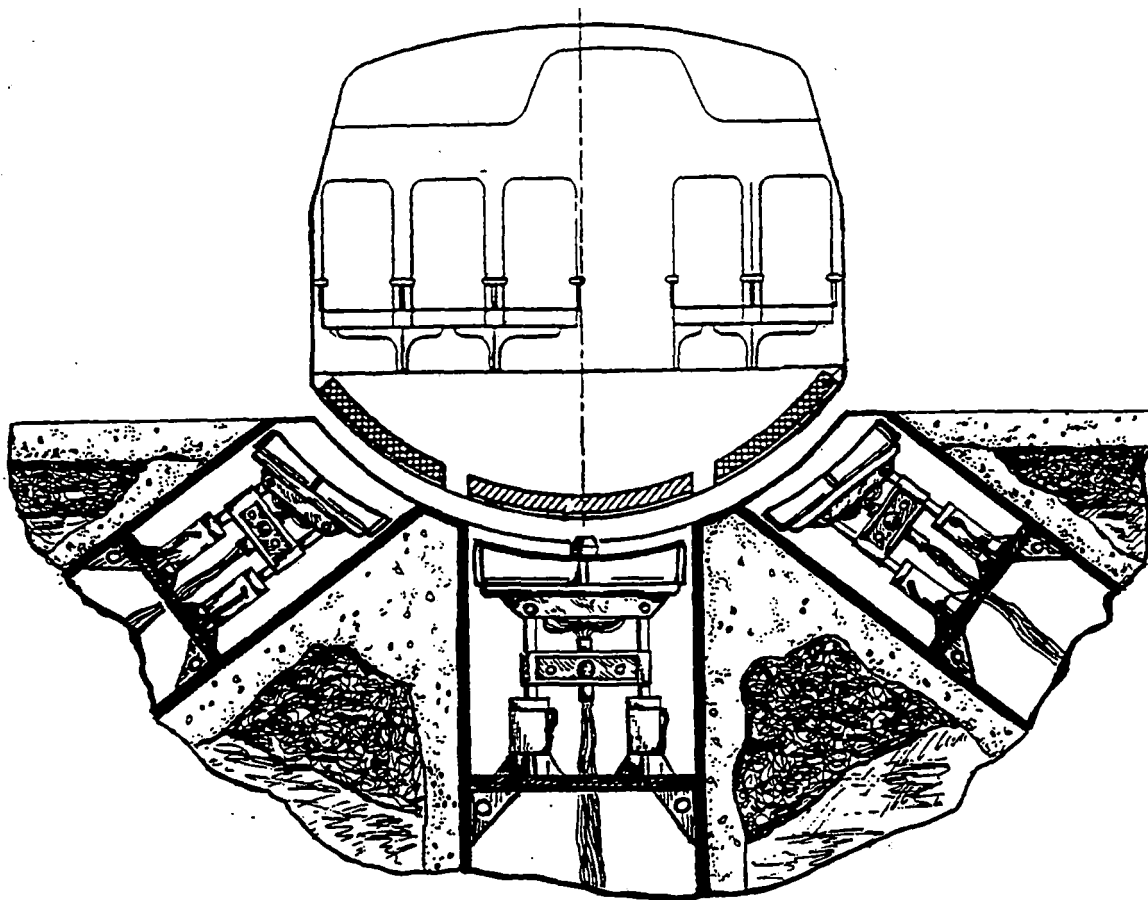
Cross-sectional view of a coil charging system (charging coils retracted)
